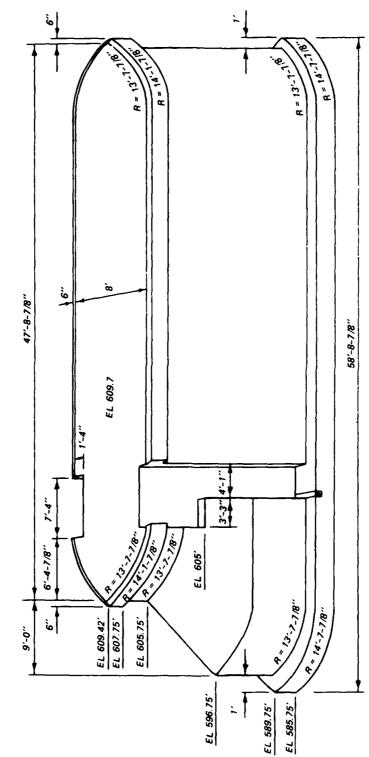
Typical geometry for dam piers 10, 11, 12, 14, 15, and 16, Soo Dam
